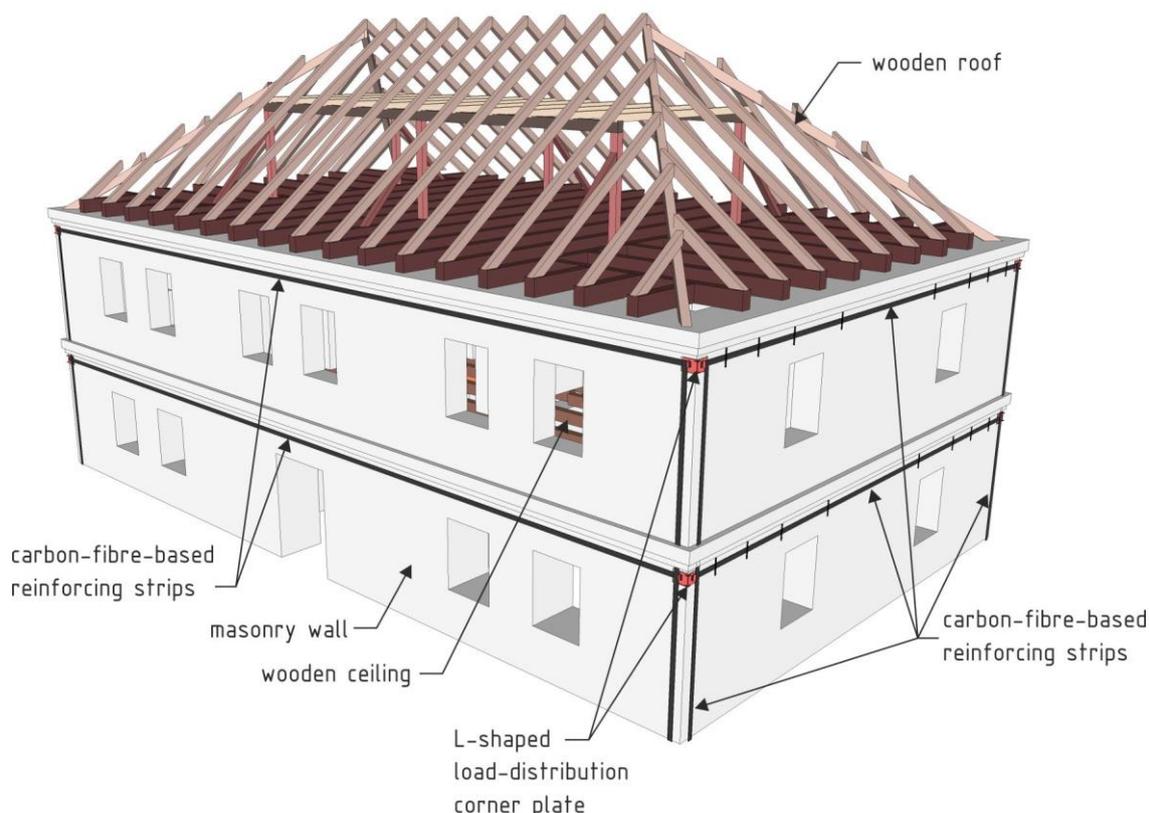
Scheme of the rectory building with a marked layout of FRP lamellas and steel anchoring and load distribution sections
